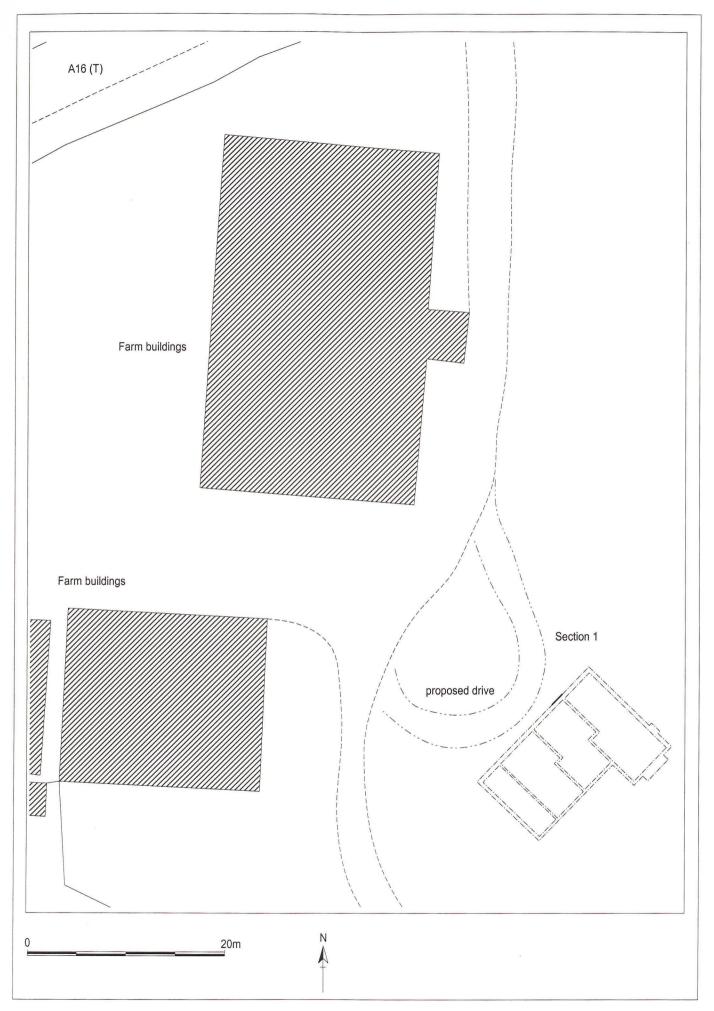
Development plan showing the location of Section $\boldsymbol{1}$
